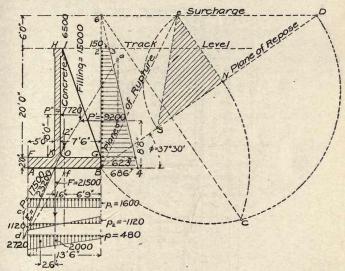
Moment and Stress Diagram for Reinforced Concrete Retaining Wall.
